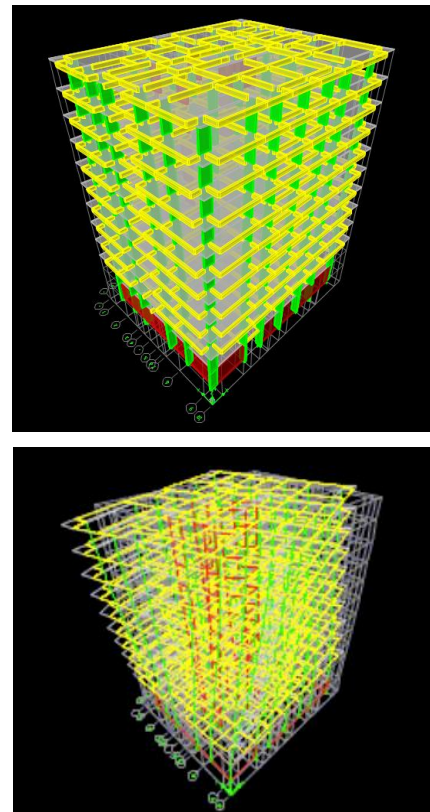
3-D finite elements modeling of RC Zumrut Building.
